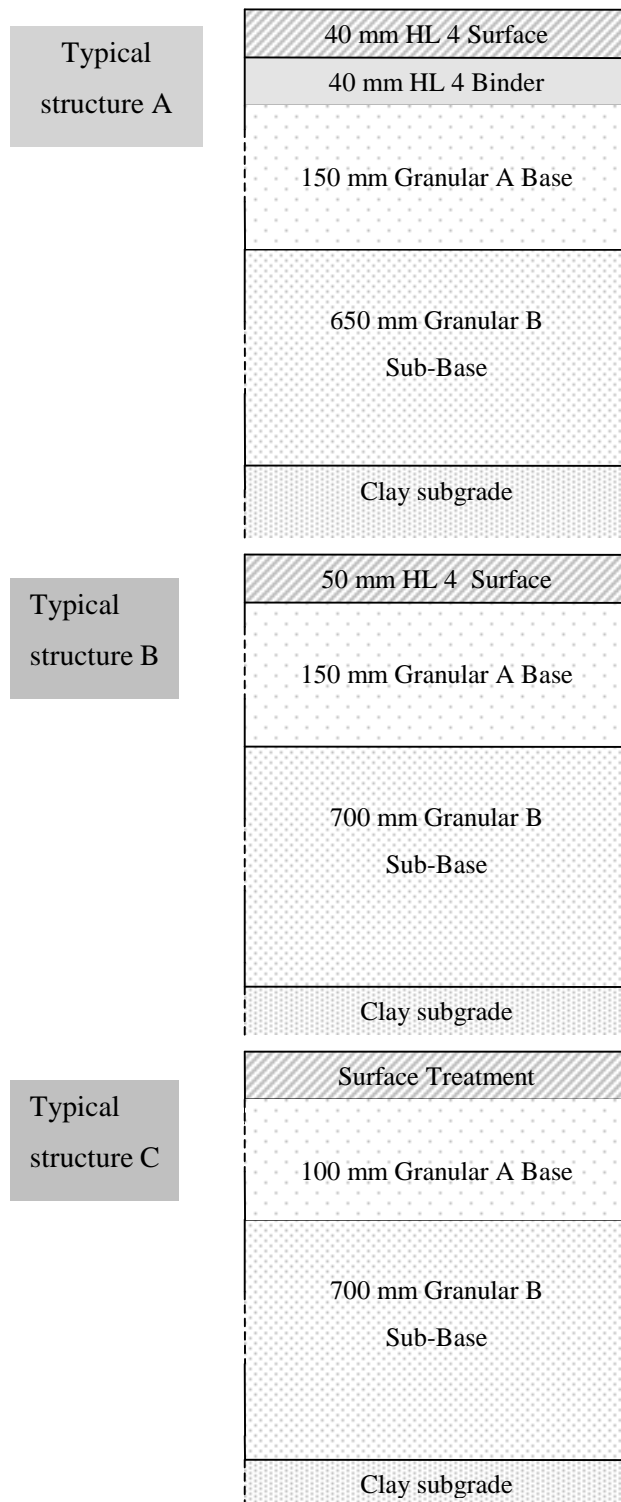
Typical Pavement Structures Used in Ontario for Low-Volume Roads
